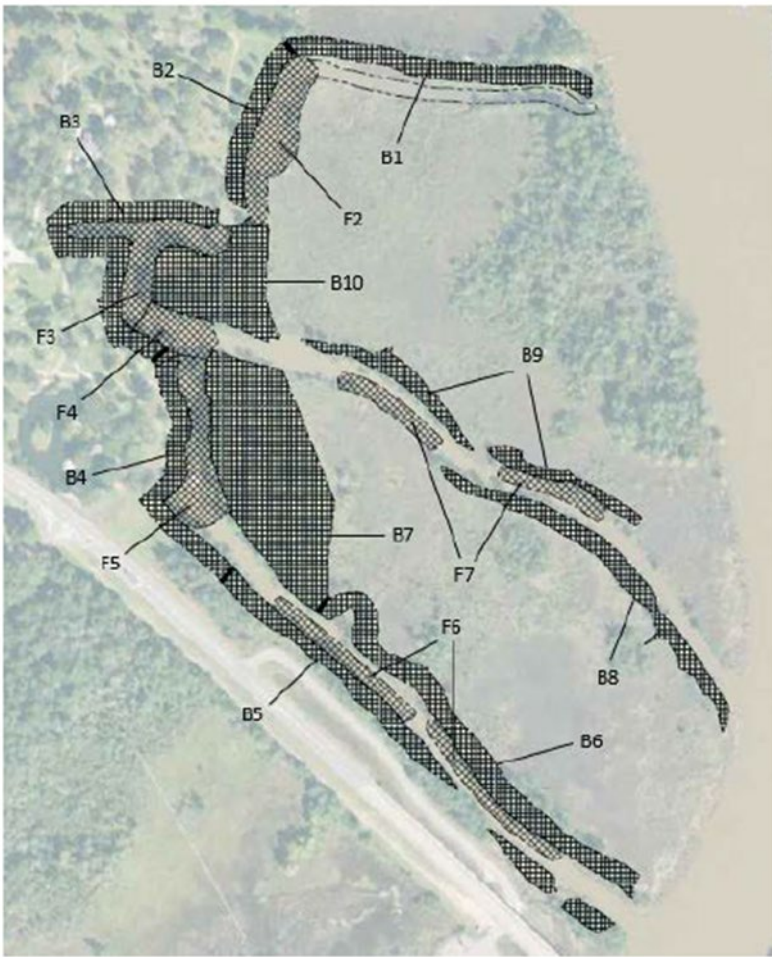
Fish River Borrow (dark)/Fill (light) Sections
